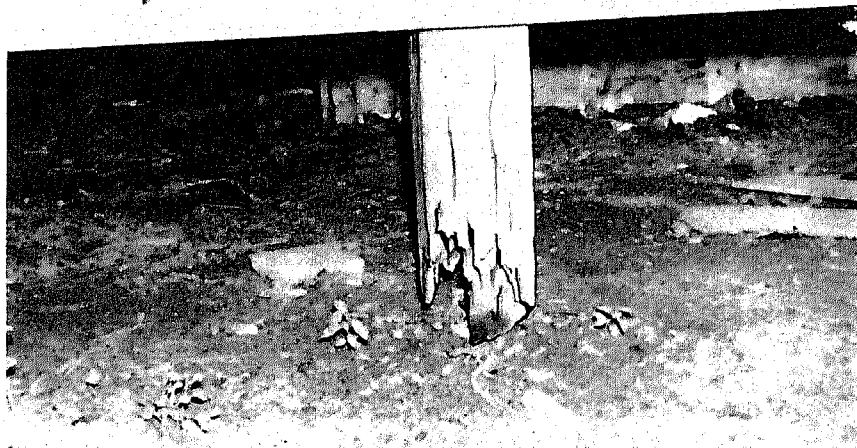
Critical termite damage to a foundation post is enough to classify a house as dilapidated. Always observe wooden posts carefully for evidence of rot or termite damage.
